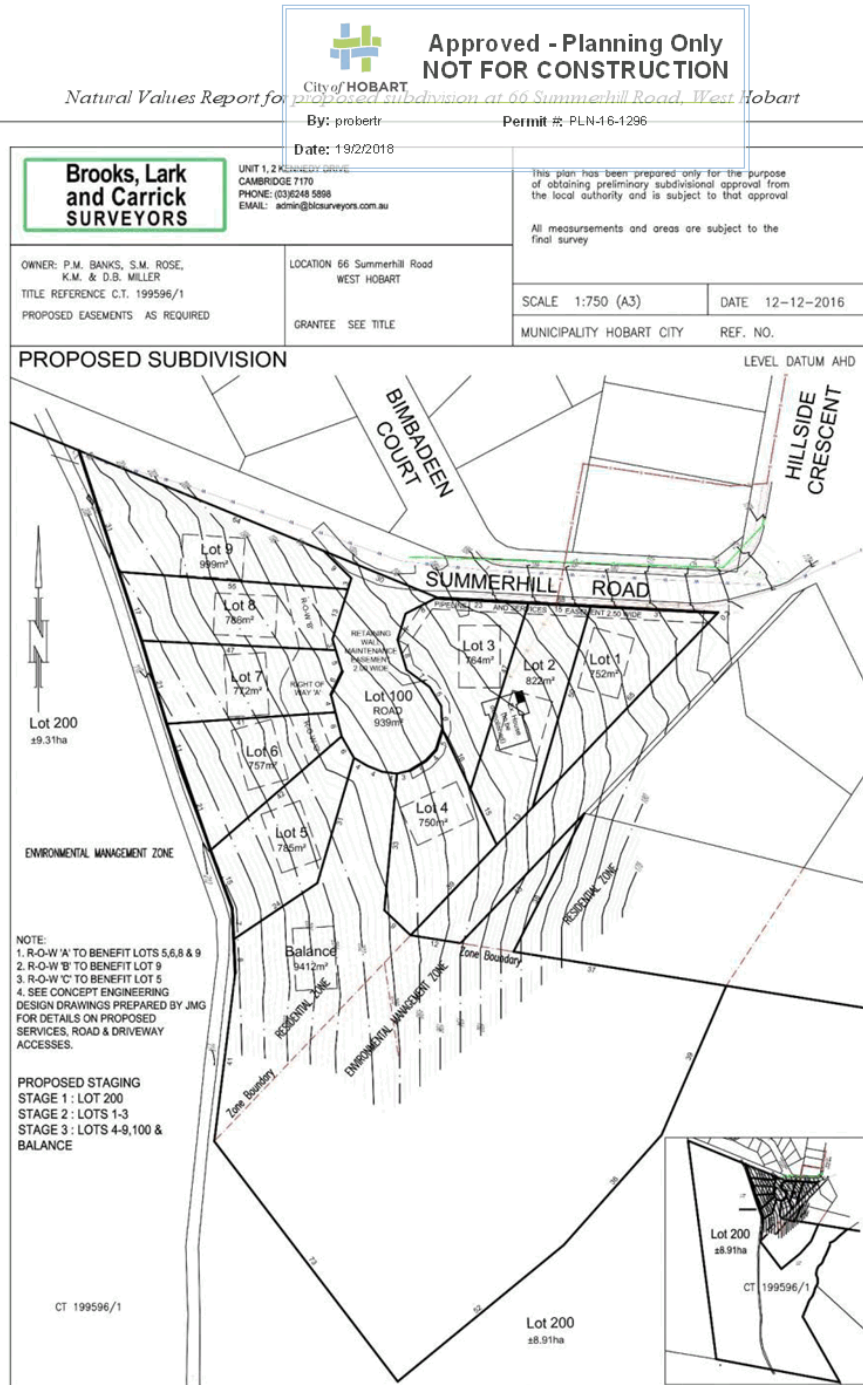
Subdivision proposal (reproduced from Brooks Lark and Carrick Subdivision Plan).
